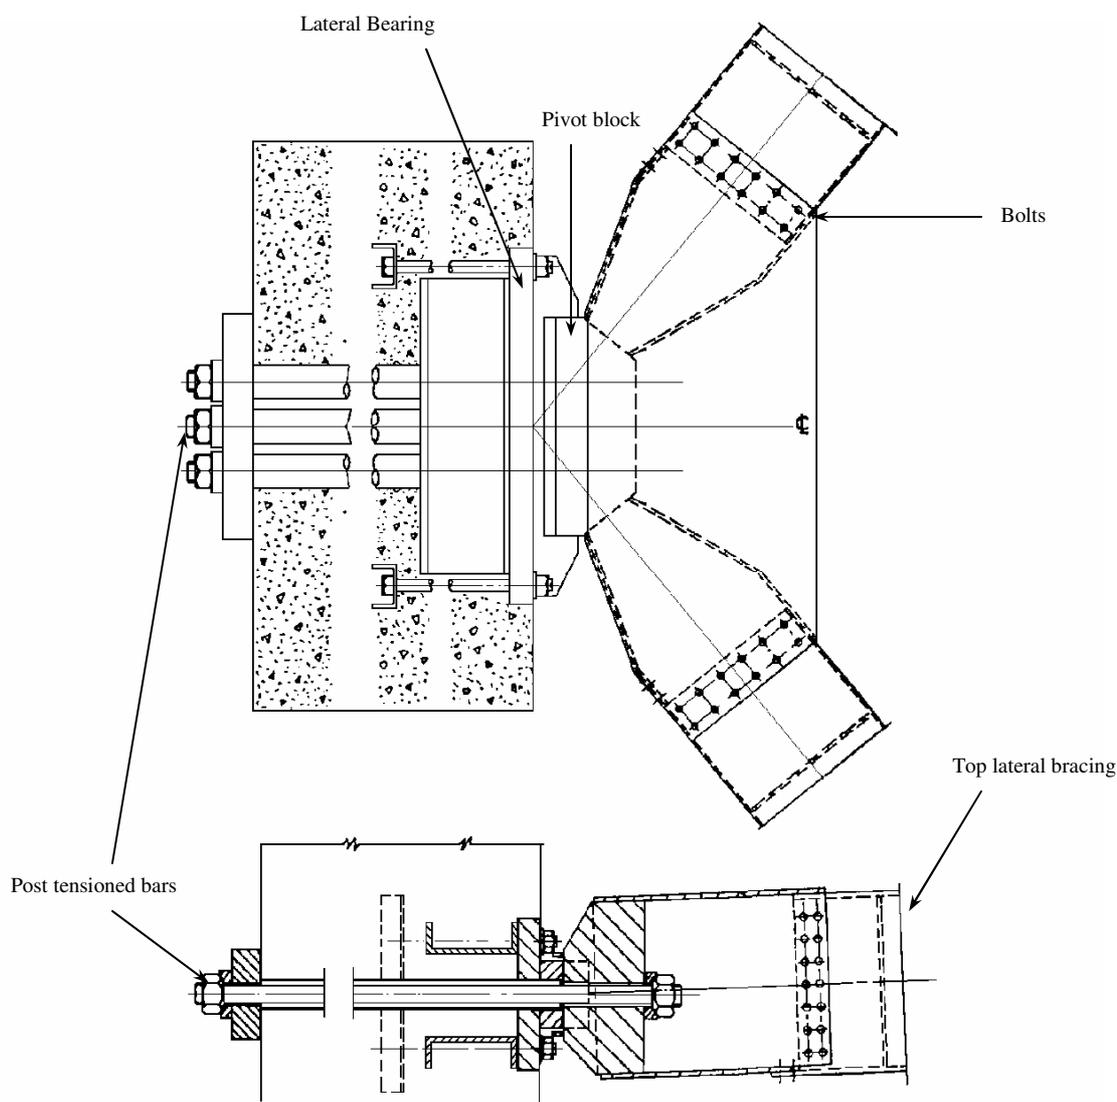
Arrangement of Lateral Bearings at Side Towers
